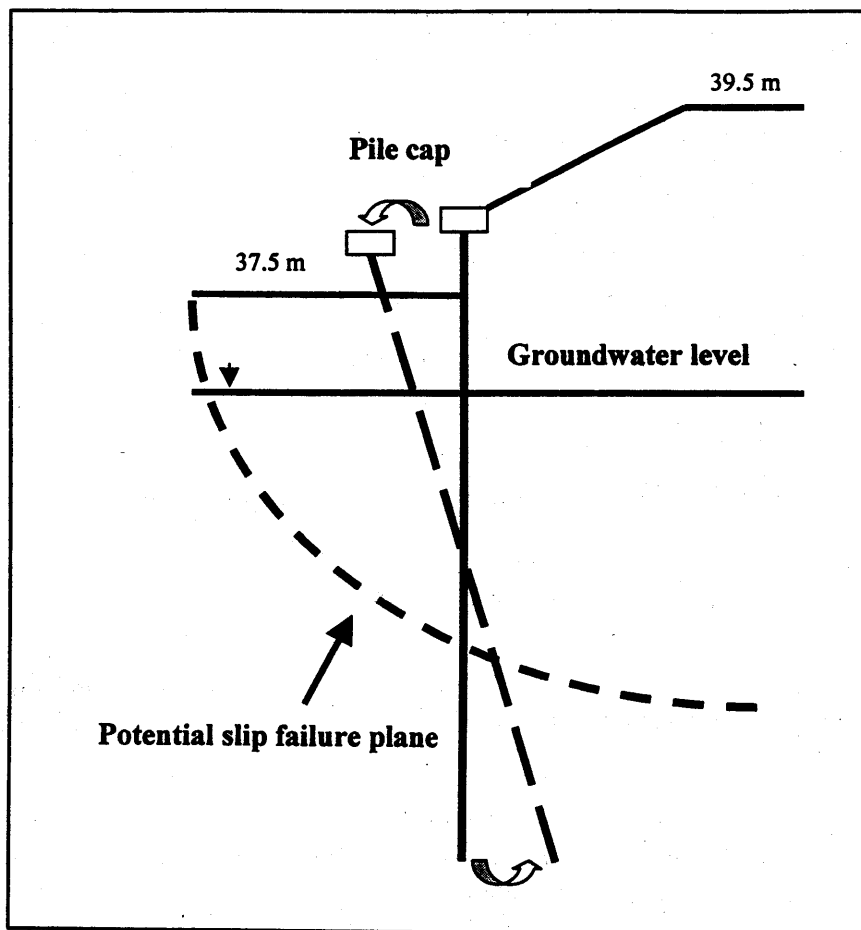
Probable mode of failure of the sheet pile wall
